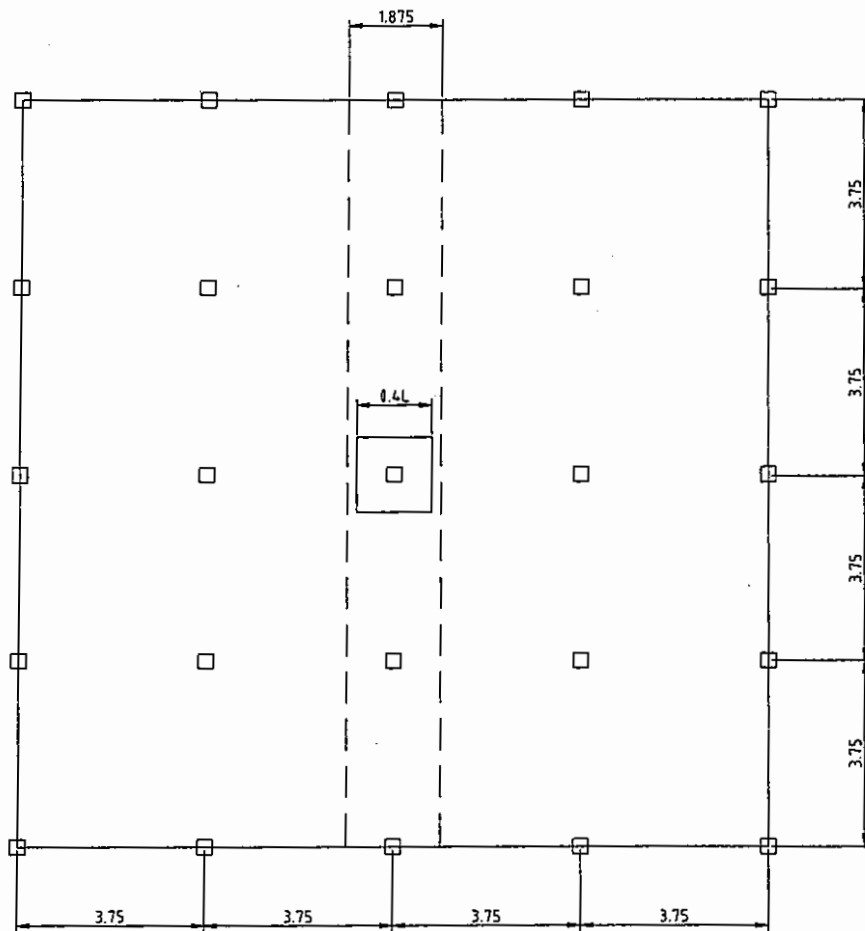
Test Specimen Shown in Equivalent Structure being Modelled (Units: mm)
